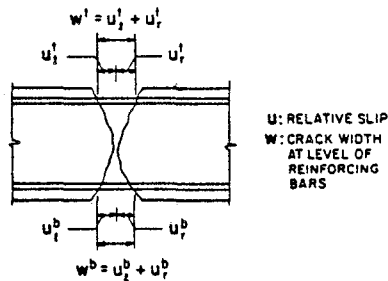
DEFINITION OF RELATIVE SLIP AND CRACK WIDTH AT A CRACKED REINFORCED CONCRETE SECTION
